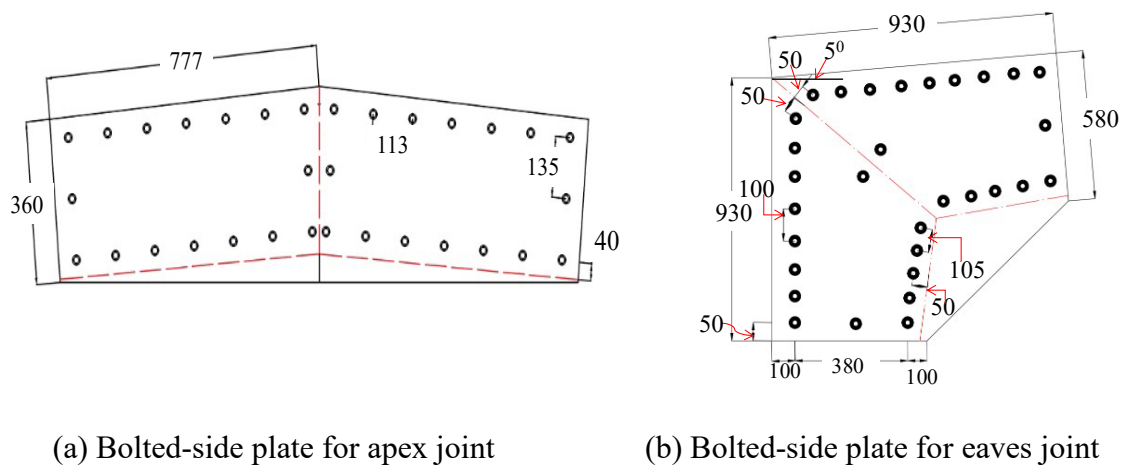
Geometric details for the bolted-side plates for the NTB portal frame (all dimensions are in millimeters)
